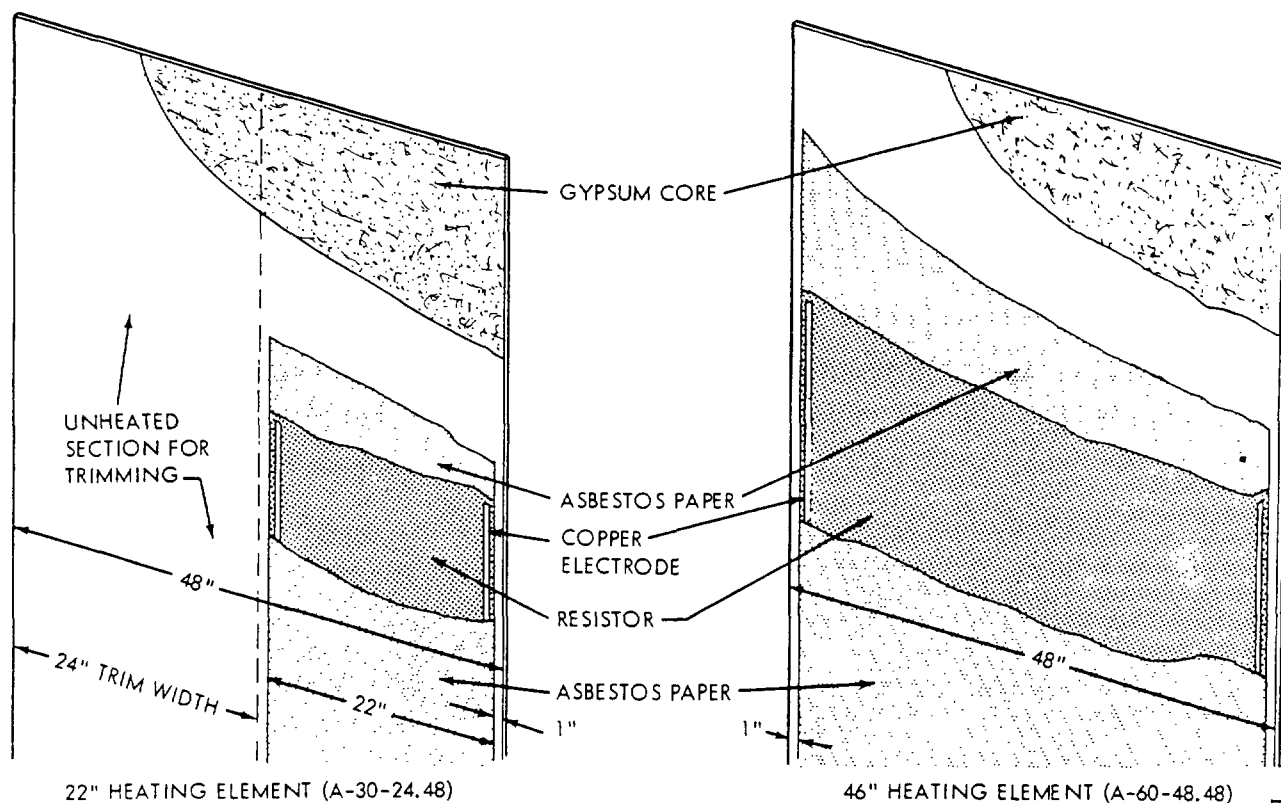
Cutaway View of THERMALUX Heating Panels
